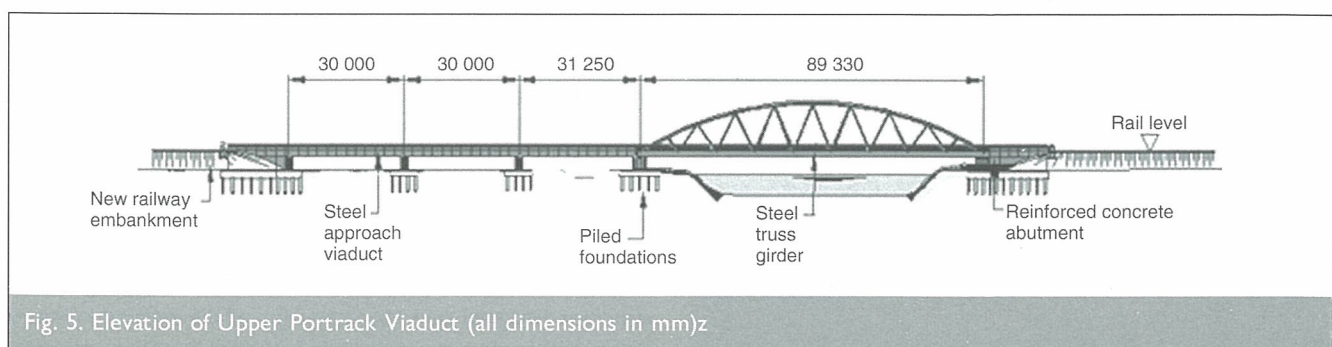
Elevation of Upper Portrack Viaduct (all dimensions in mm)
